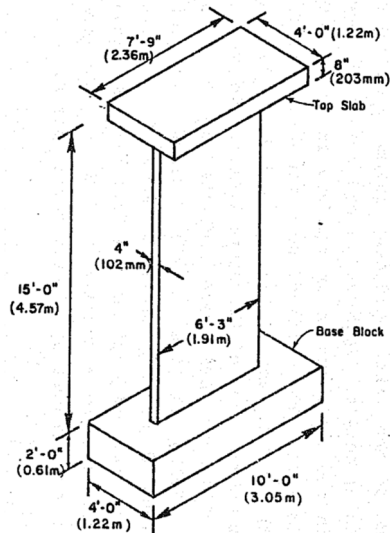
Nominal dimensions of test specimen with rectangular web-section (Oesterle et al. 1979)
